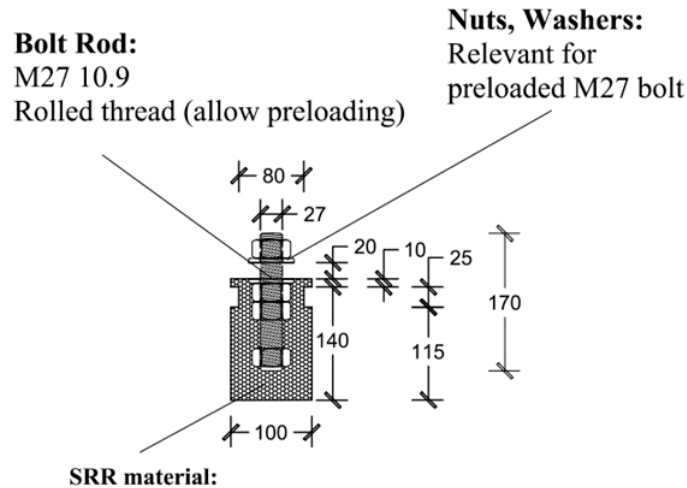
Design connection FRP bridge deck to steel superstructure proposed by A. Christoforidou
